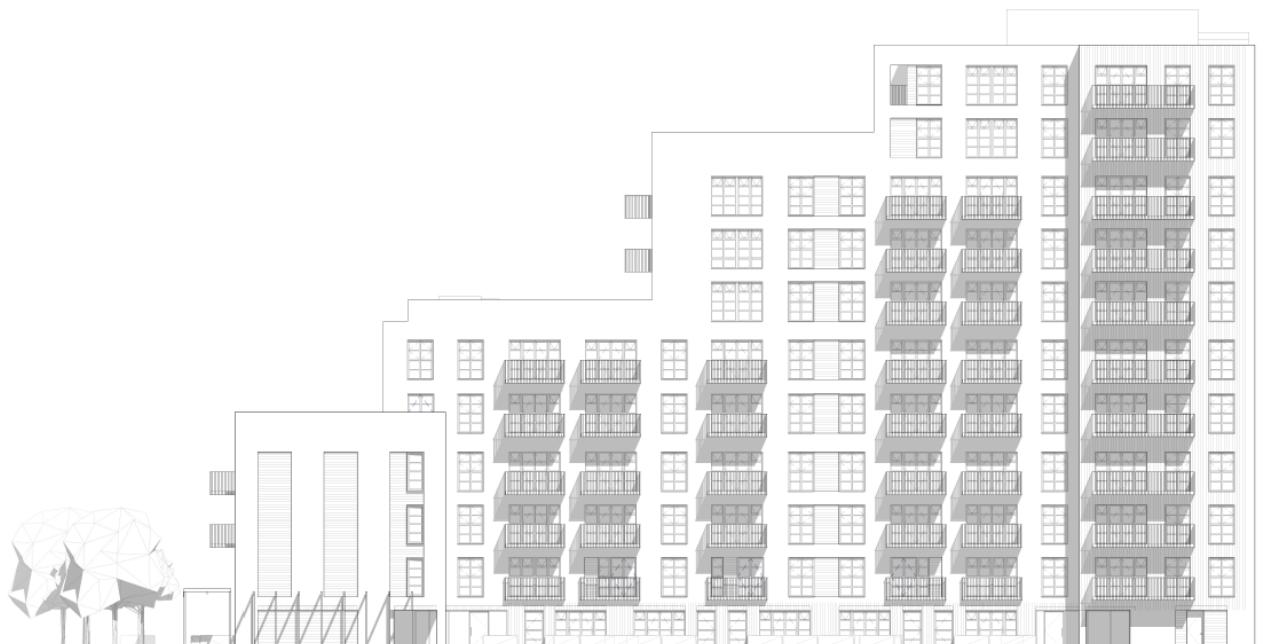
Proposed 9 Nestles Avenue scheme – SE elevation (TateHindle Limited Architects)
